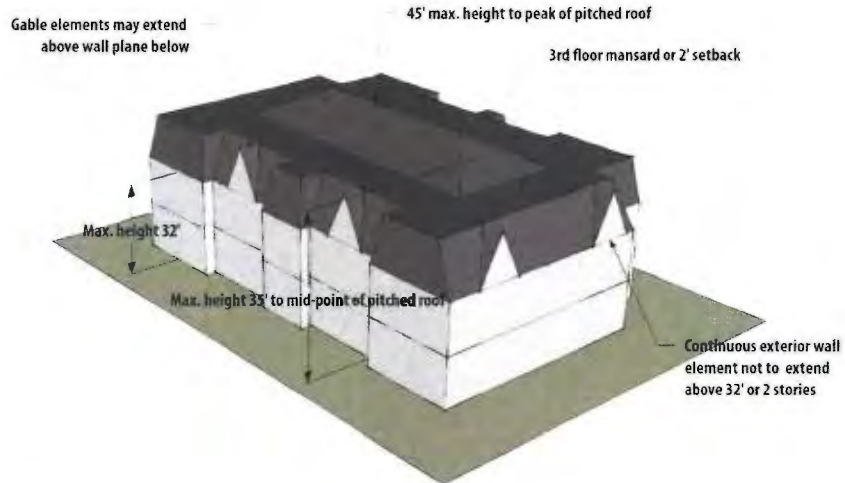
Senior Living Campus Building Heights Facing Villa Drive
